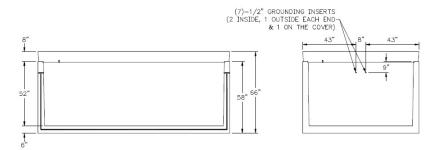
7' × 12' (94"× 155") Shallow Vault Ground Grid Layout
